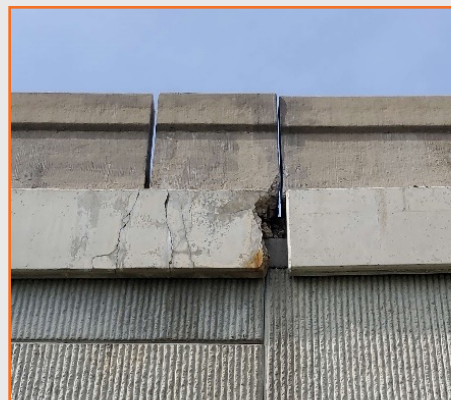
SRT retaining wall coping cracking and spalling NBML at Spring Creek Pkwy.
